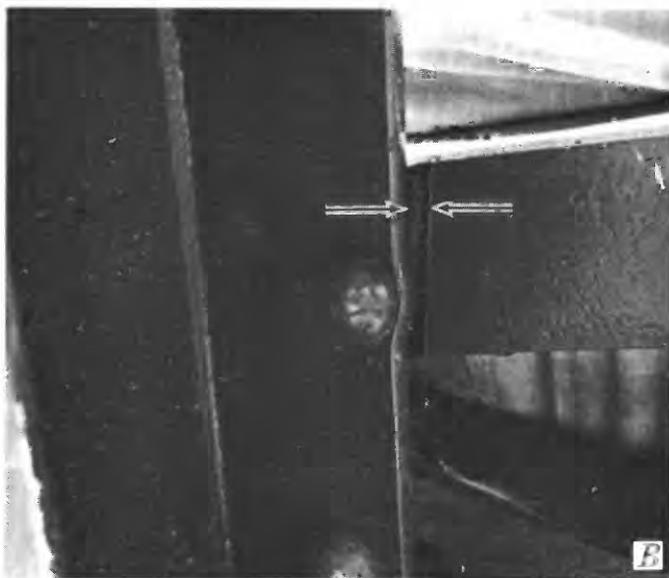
Deformation of Monterey County road bridge (No. 444) over Cholame Creek, just southwest of the main fracture zone and about 0.1 mile northwest of Wilson's house. A. Buckled swaybraces, viewed southeastward at right angles to length of bridge. B. Freshly scraped paint (between arrows) and partial bearing failure (at rivet near center) between vertical steel pier (at left) and steel swaybrace.
